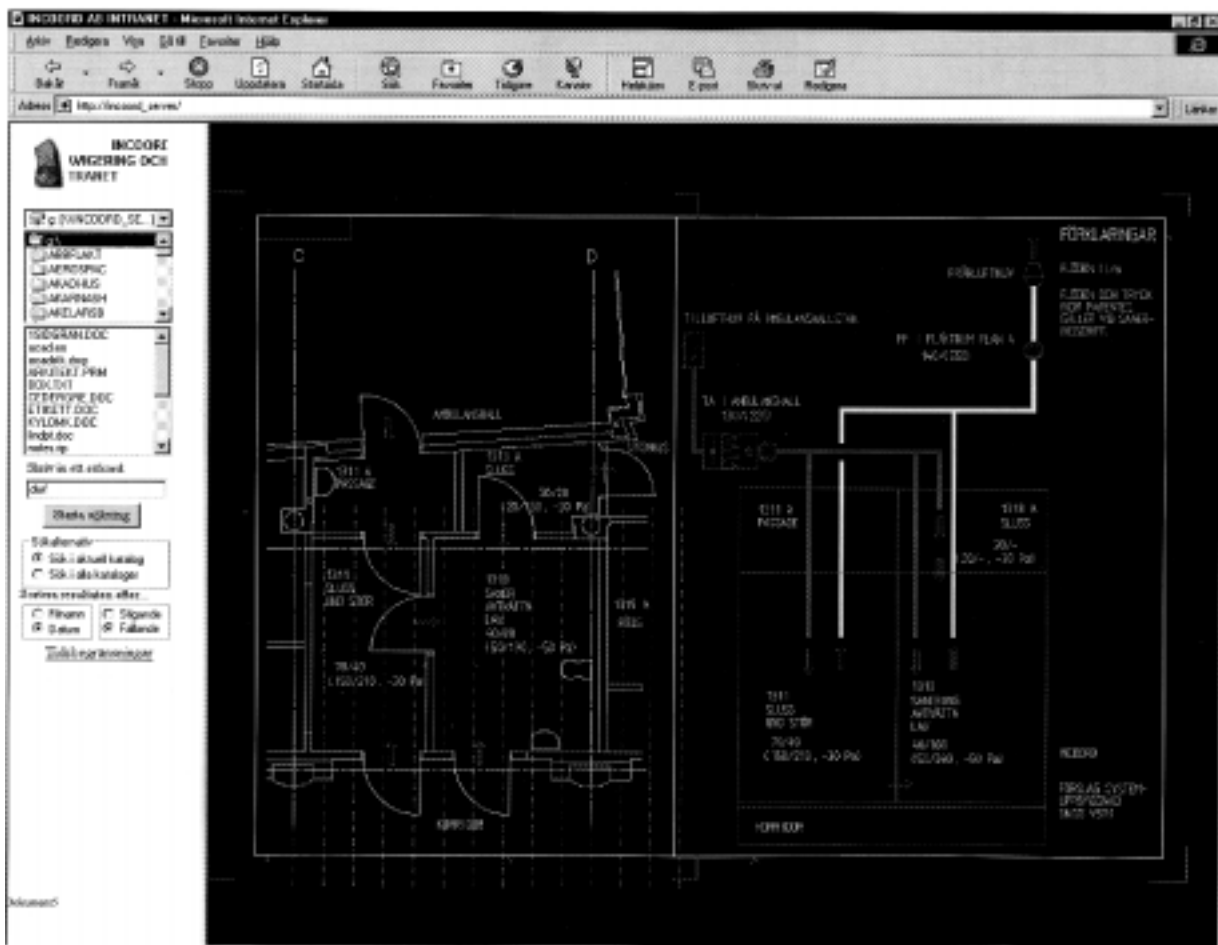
CAD drawing in dwf (drawing web file) format. The drawing contains links to material supplier Internet sites for technical information on components.
